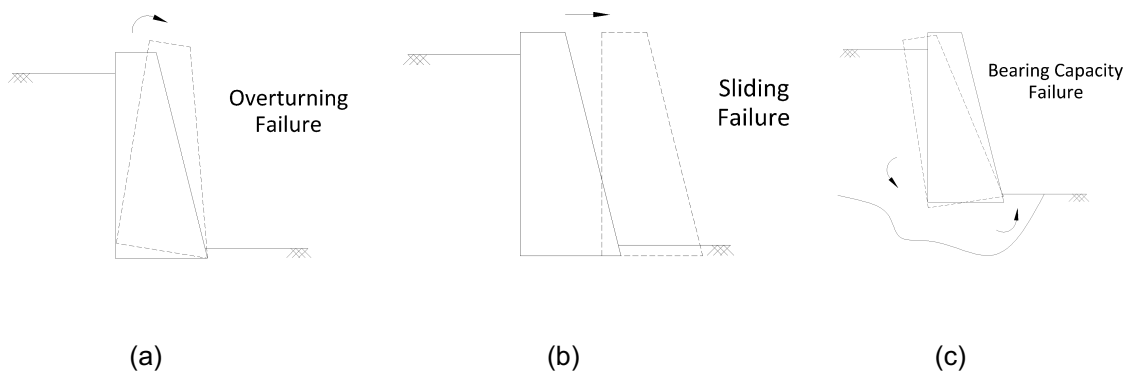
Failure modes of a retaining wall: (a) overturning (b) sliding (c) bearing capacity [2]
